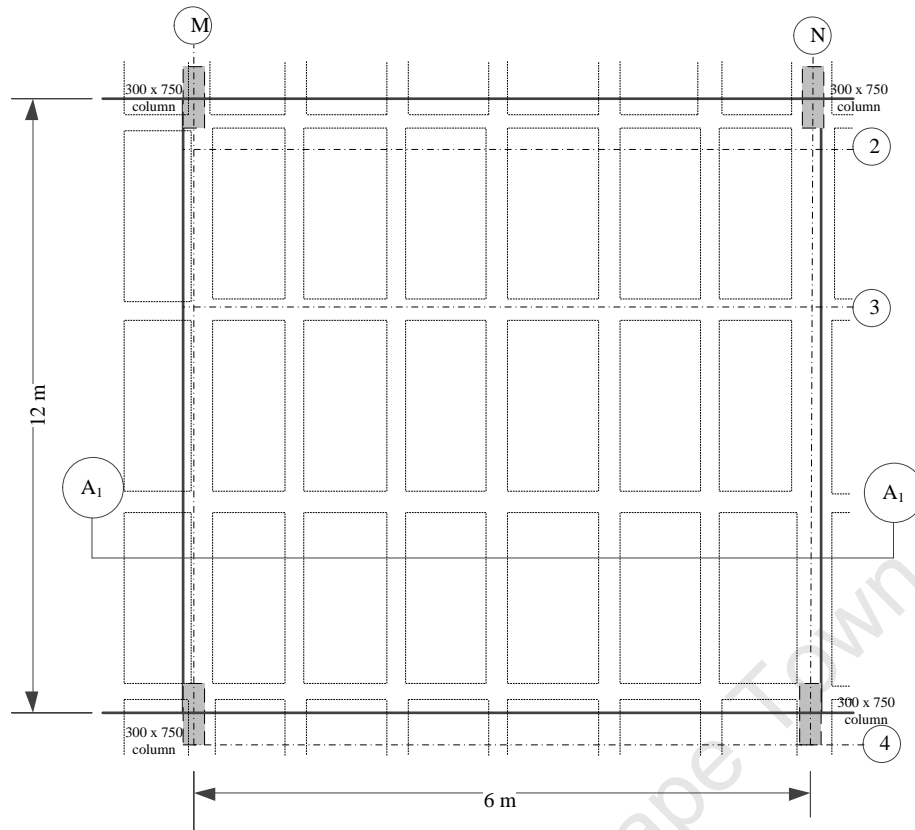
Interior panel of the ribbed floor slab in level 6 of the New Engineering Building (Not to scale).
